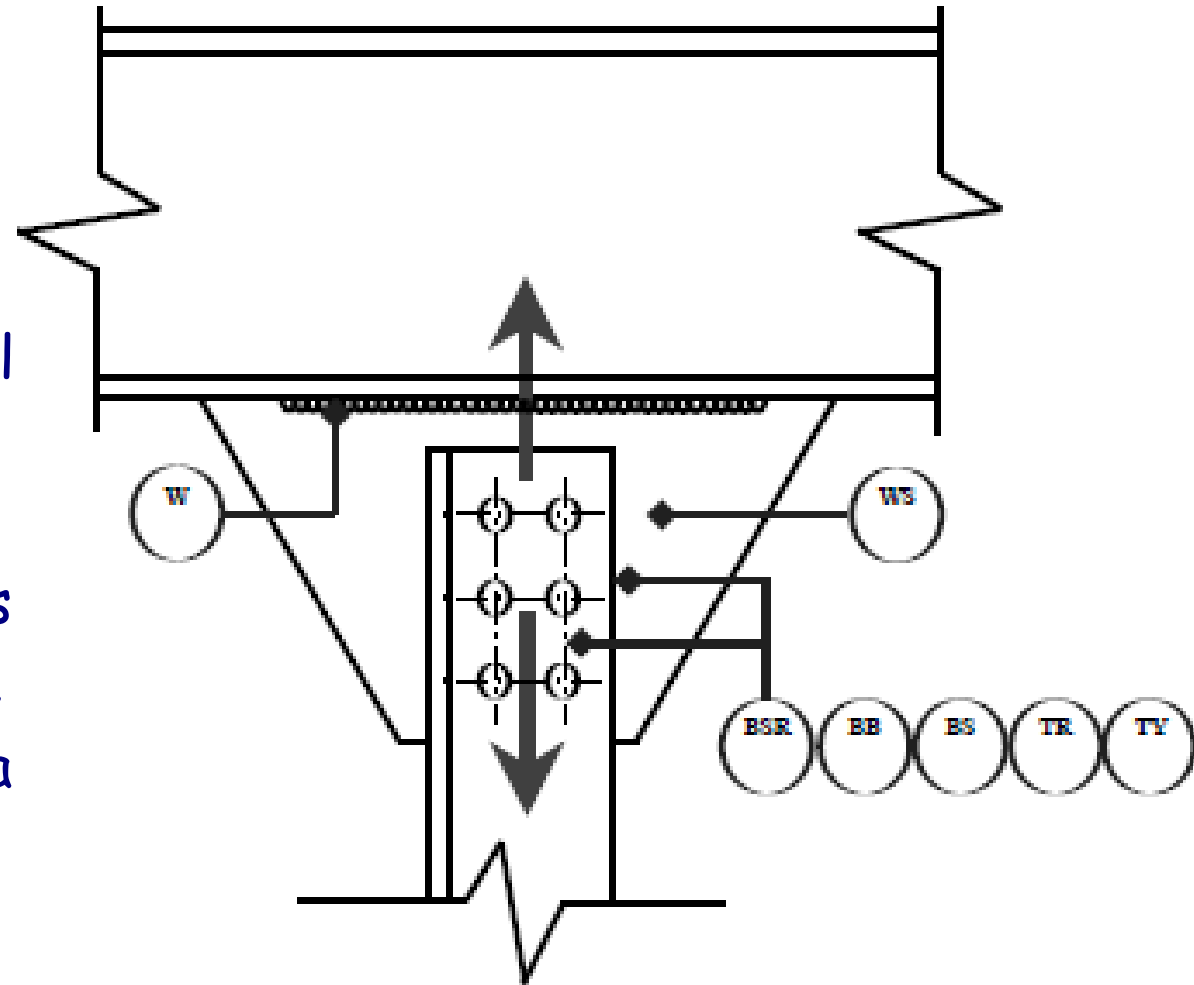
Tension Connection (Gusset Plate); Potential Limit States
